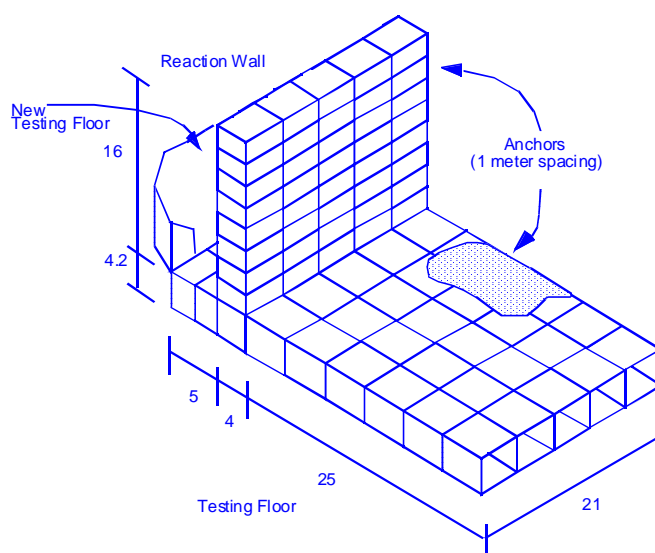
Reaction wall/floor facility (dimensions in *m*) at the ELSA laboratory (Pinto, 1998)
